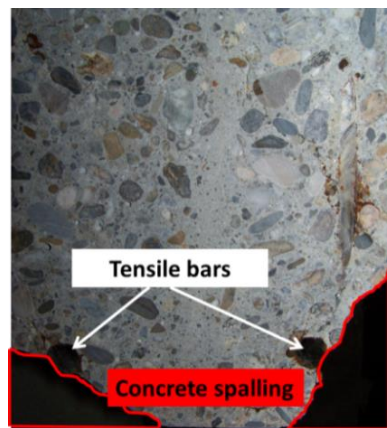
Typical cross-section of corroded beam with spalling in the corners
